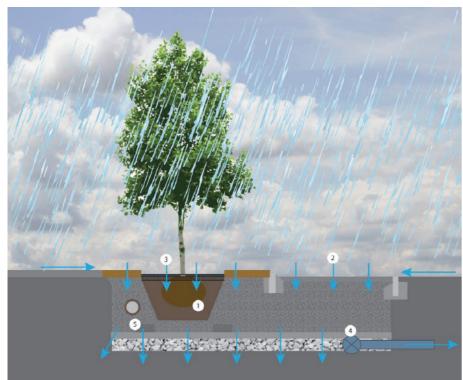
DMURS Gudiance Note 5 - Tree Pit Section
